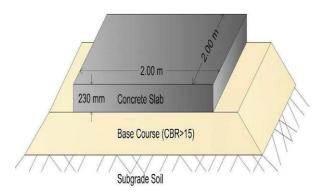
Layout of Concrete Pavement Slab with Various Layers
